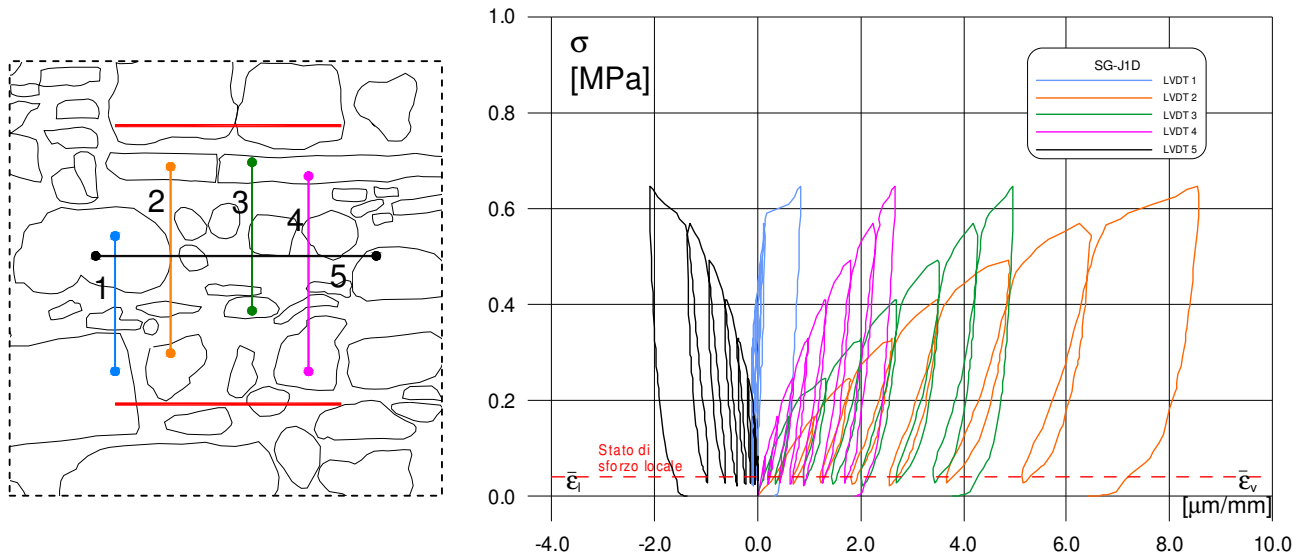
Double flat jack test on the masonry wall dividing the nave from the left aisle.
